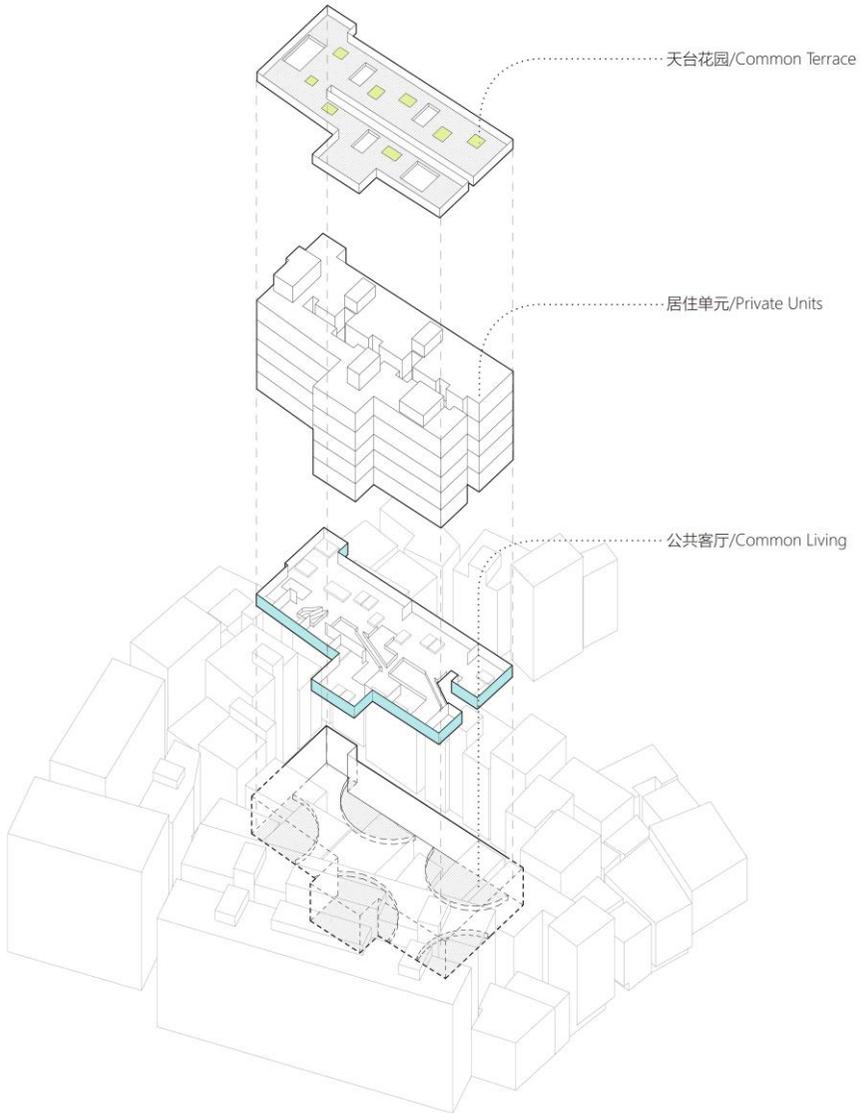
Isometric drawing of No.8 Port Apartment, a building which doesn't have façade
